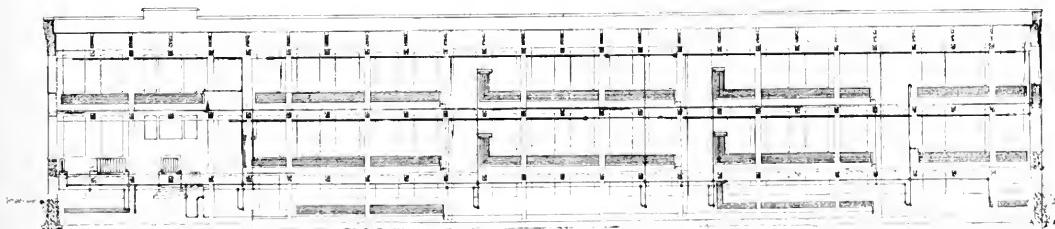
LONGITUDINAL SECTION OF MAIN BUILDING, LOOKING SOUTH.
